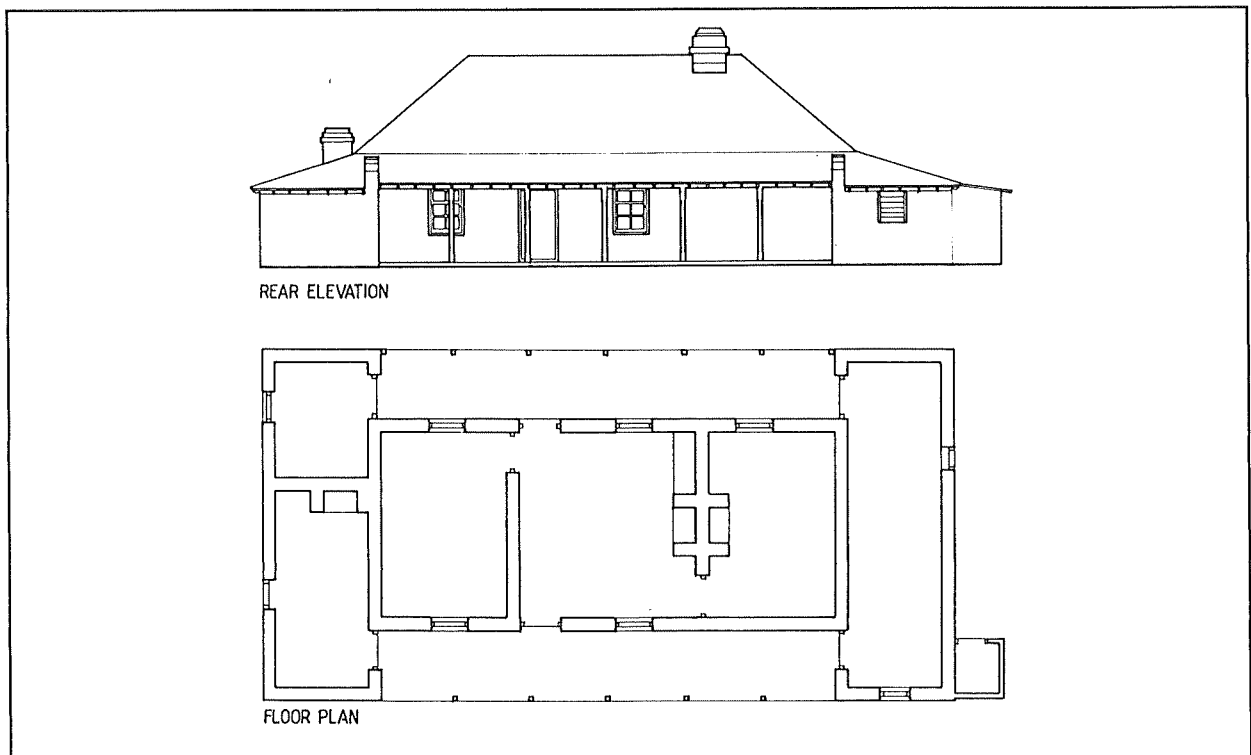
Greenwood cottage, built in 1866 and located north of Lake Clifton. The front and rear elevations of this building, having a verandah flanked by rooms at either end, are similar to *Ellendale*.
